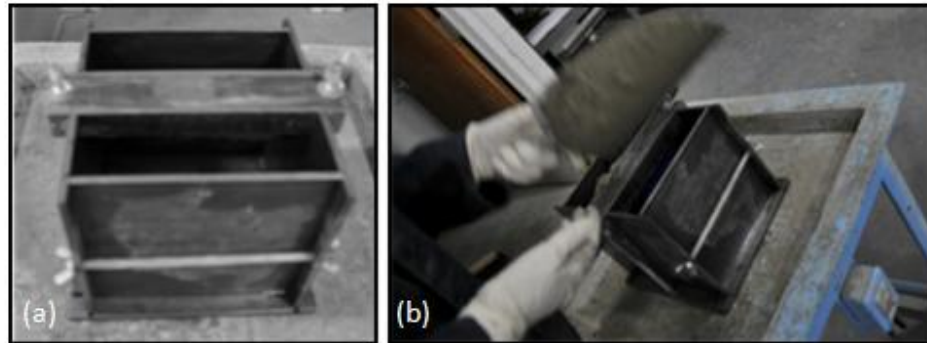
(a) WST-specimen steel mold, (b) Casting the WST-specimen on a vibration table
